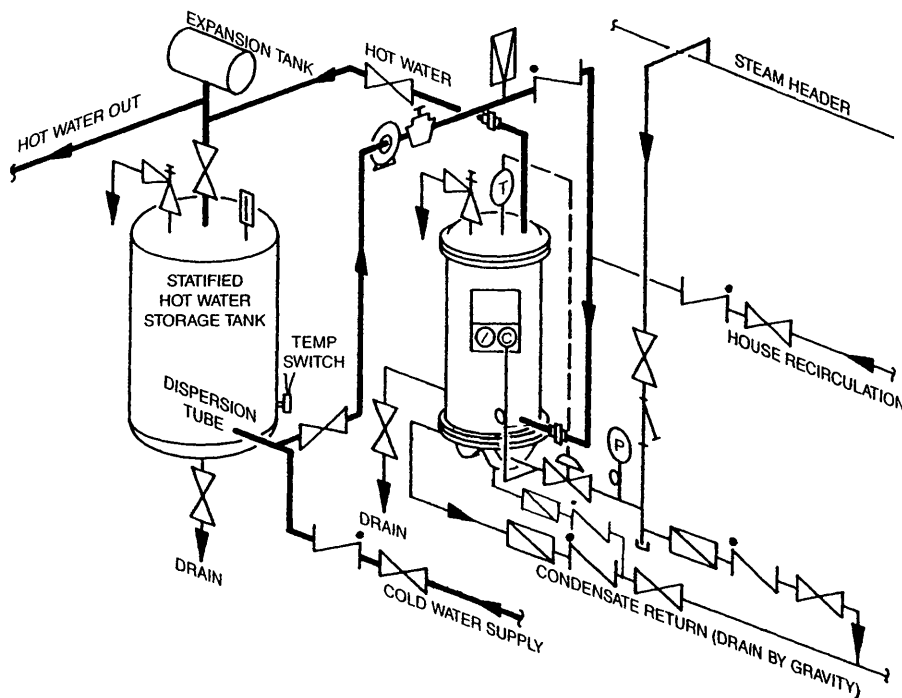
Piping Connections for a Single Steam to Water Heater with a Stratified Storage Tank
